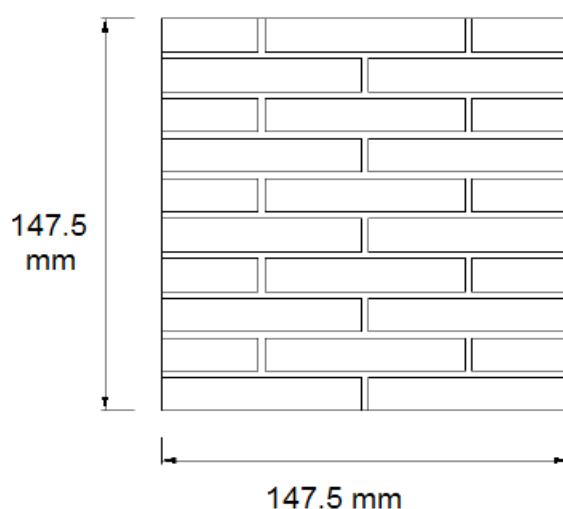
Layout of the prism specimen used for compressive strength and Young's modulus test.
